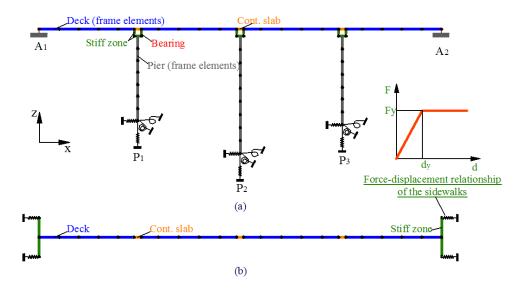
The model of the upgraded bridge: (a) Longitudinal section and (b) Plan view
